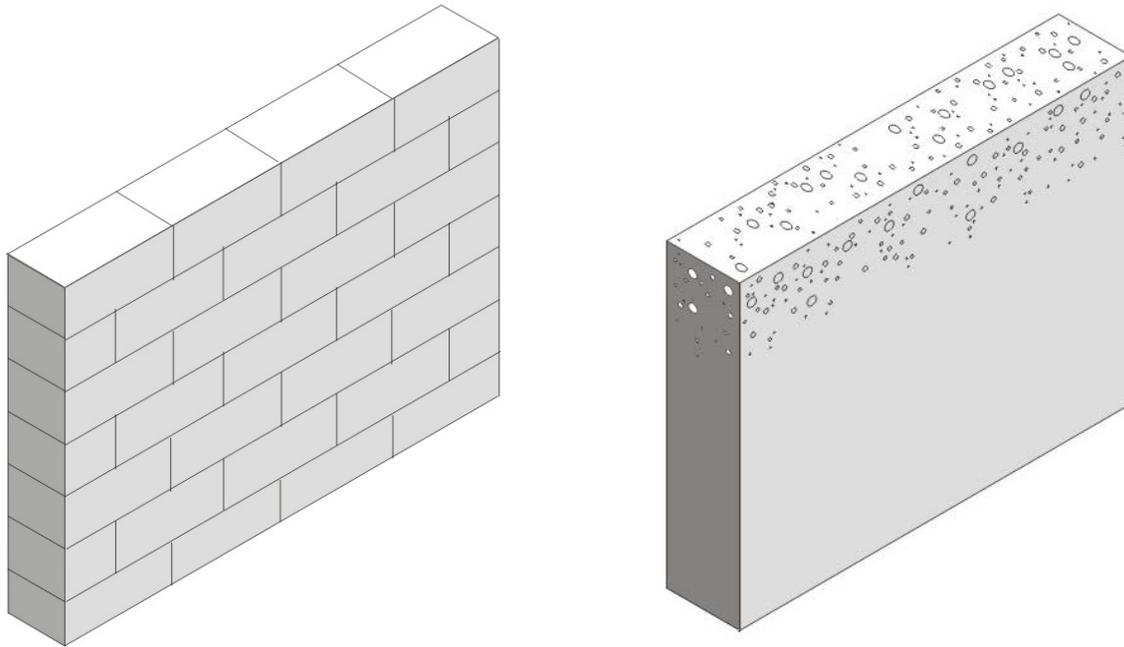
Solid Unit Masonry (left) and Solid Concrete (right) Walls
